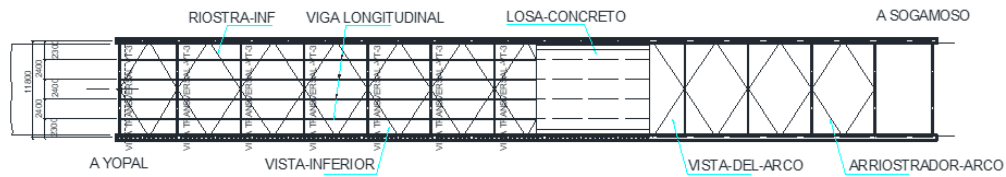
Unete arch Steel bridge top view of decking system, and arch relative bracing system
